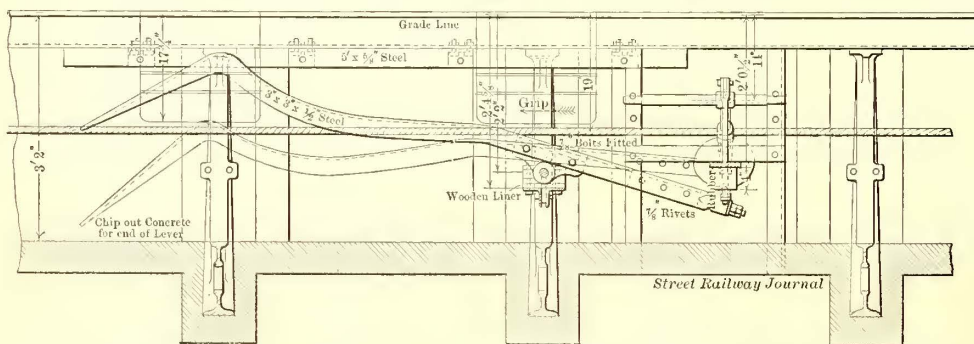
SIDE ELEVATION OF AUTOMATIC PICK-UP—WASHINGTON & GEORGETOWN RAILROAD.
